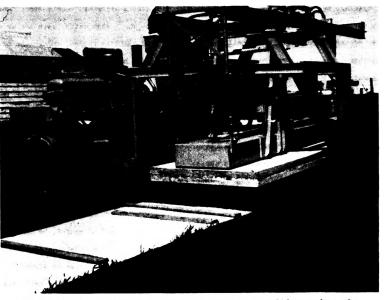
A converted farm tractor to carry vacuum lifter and panels.
